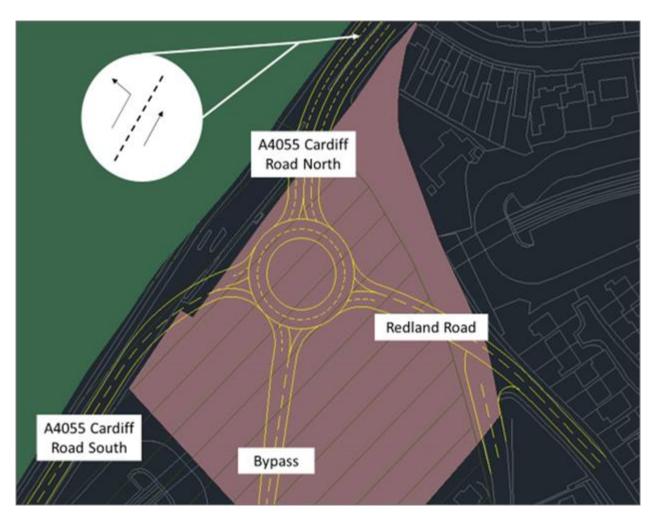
Proposed Bypass Roundabout to the south of the Merrie Harrier Junction
